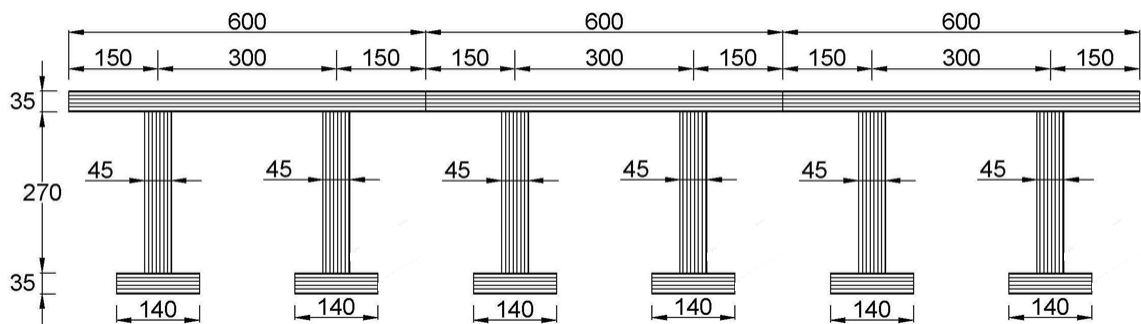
Floor System (by connecting three 8m modules side by side)
